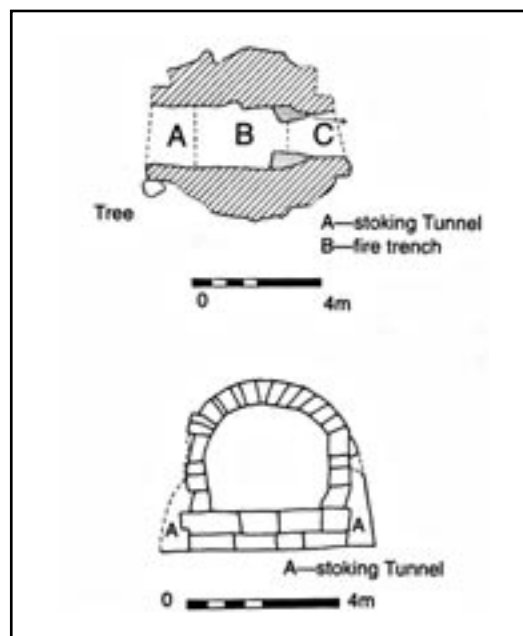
Plan and elevation of the glasshouse at Shinrone with flue running from north-east (on the left) to south-west (on the right)
